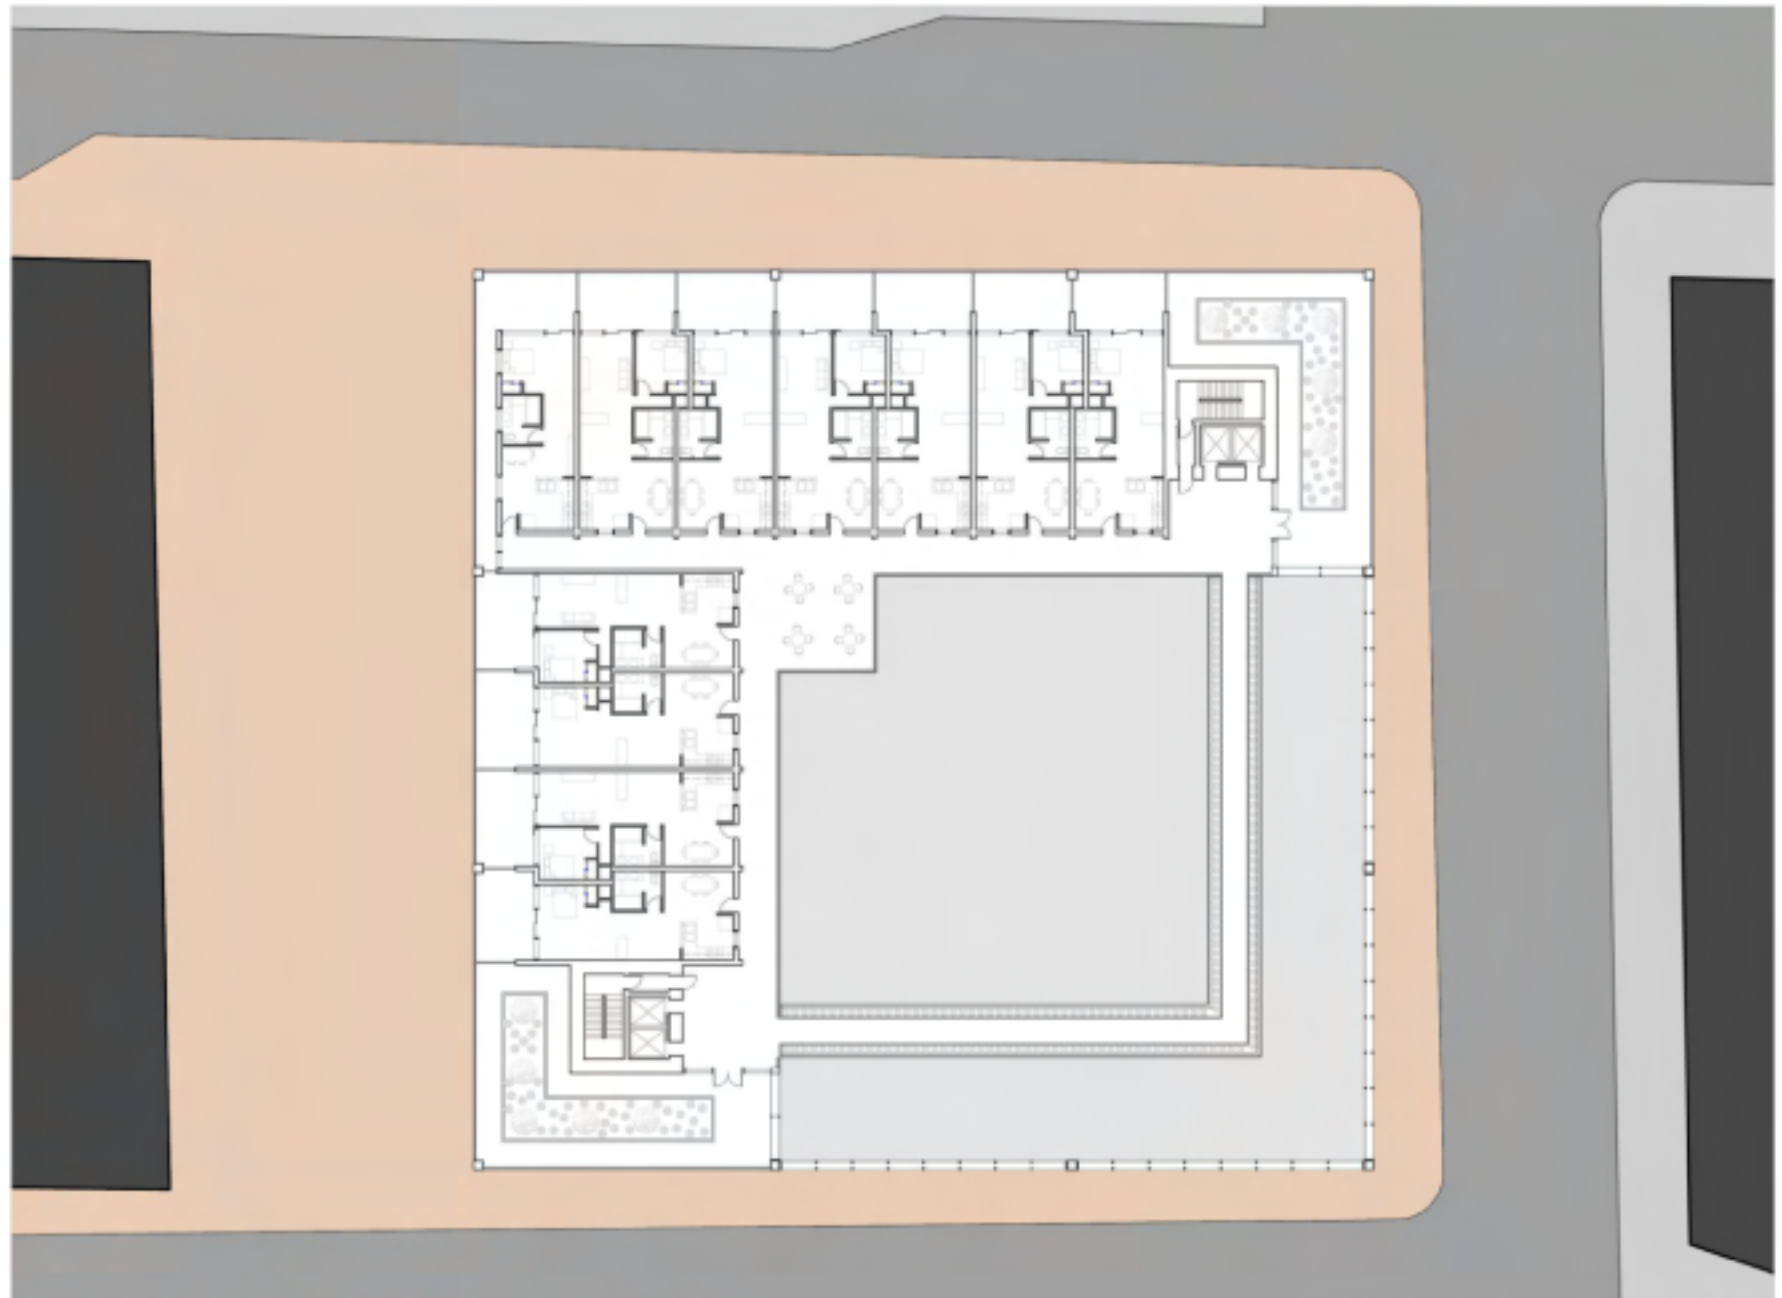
Sixth Floor Plan [Created using AutoCAD and Photoshop]
